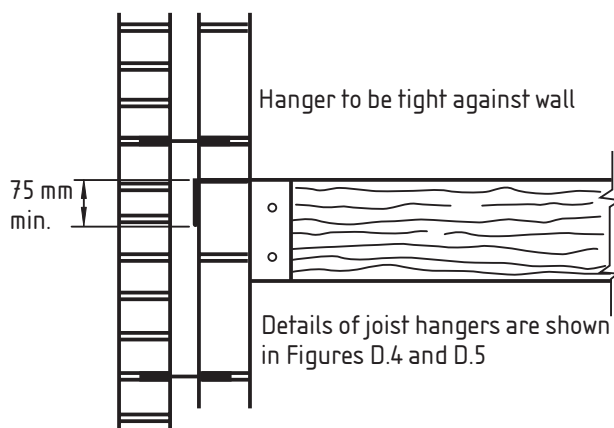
to D.14 illustrate connections that may be used to provide horizontal lateral restraint in accordance with 24.2.3. Tension straps or joist hangers and their fixings should conform to BS EN 845-1 and be capable of resisting lateral loads as specified in 24.2.2. The connections should be provided at intervals of not more than 2 m in houses of not more than three storeys, and not more than 1.25 m for all storeys in all other buildings. In the illustrations, floors are generally shown; however, the same details are applicable to roofs.
